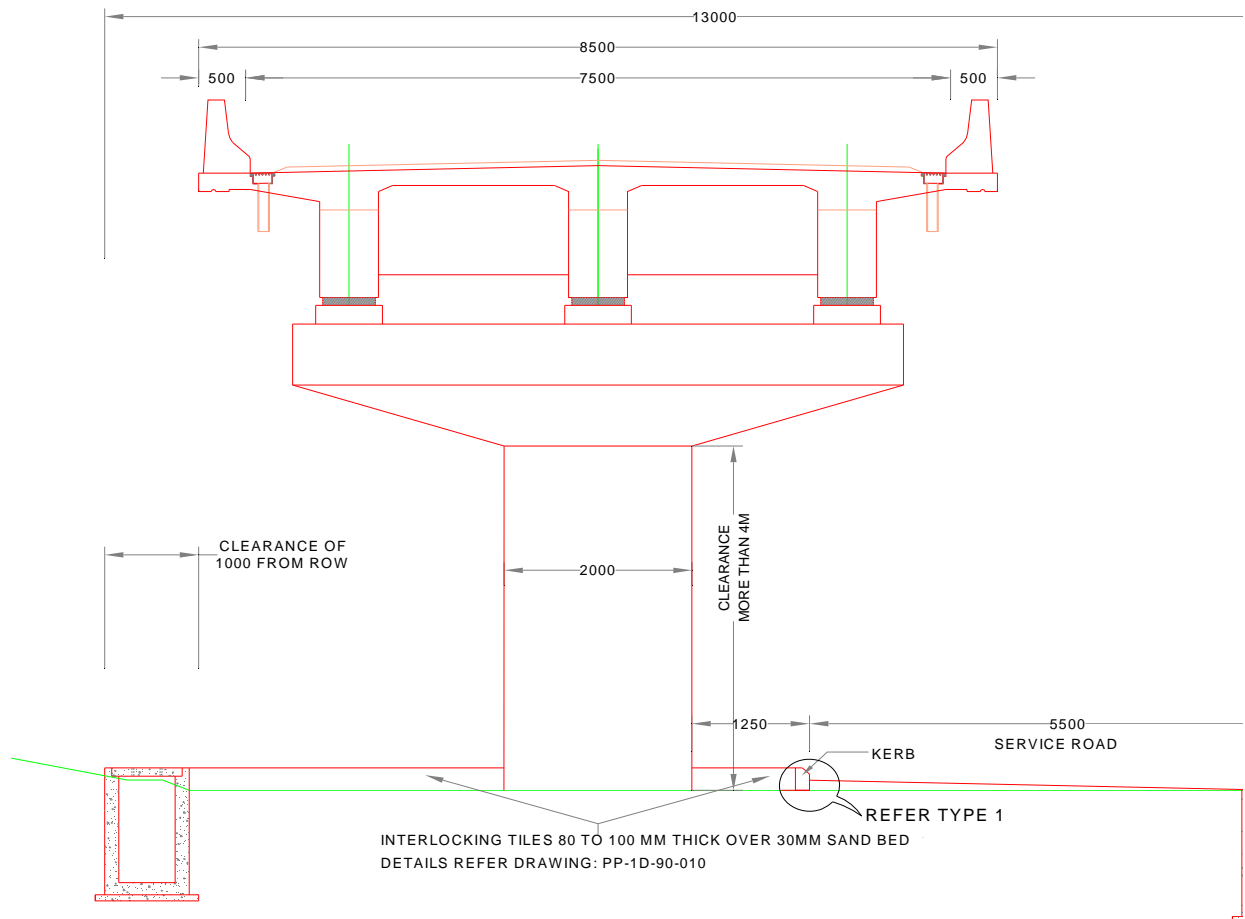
TYPICAL CROSS SECTION- TYPE-9
